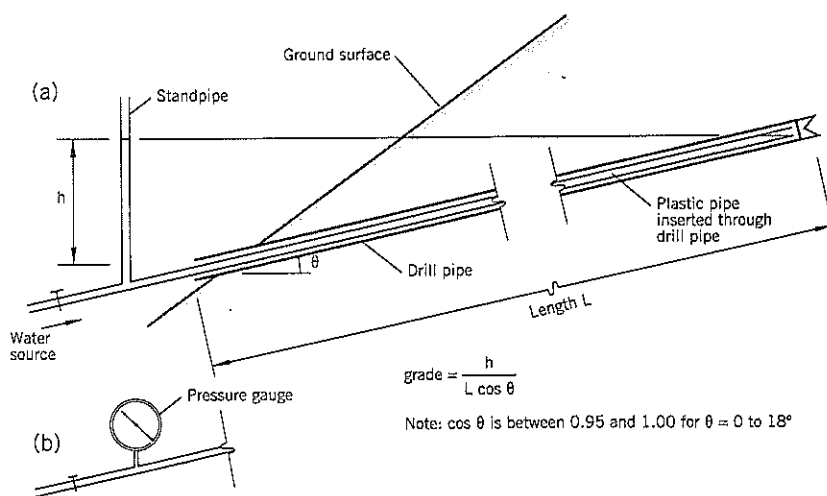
Measurement of the slopes and elevations within a horizontal drain:
